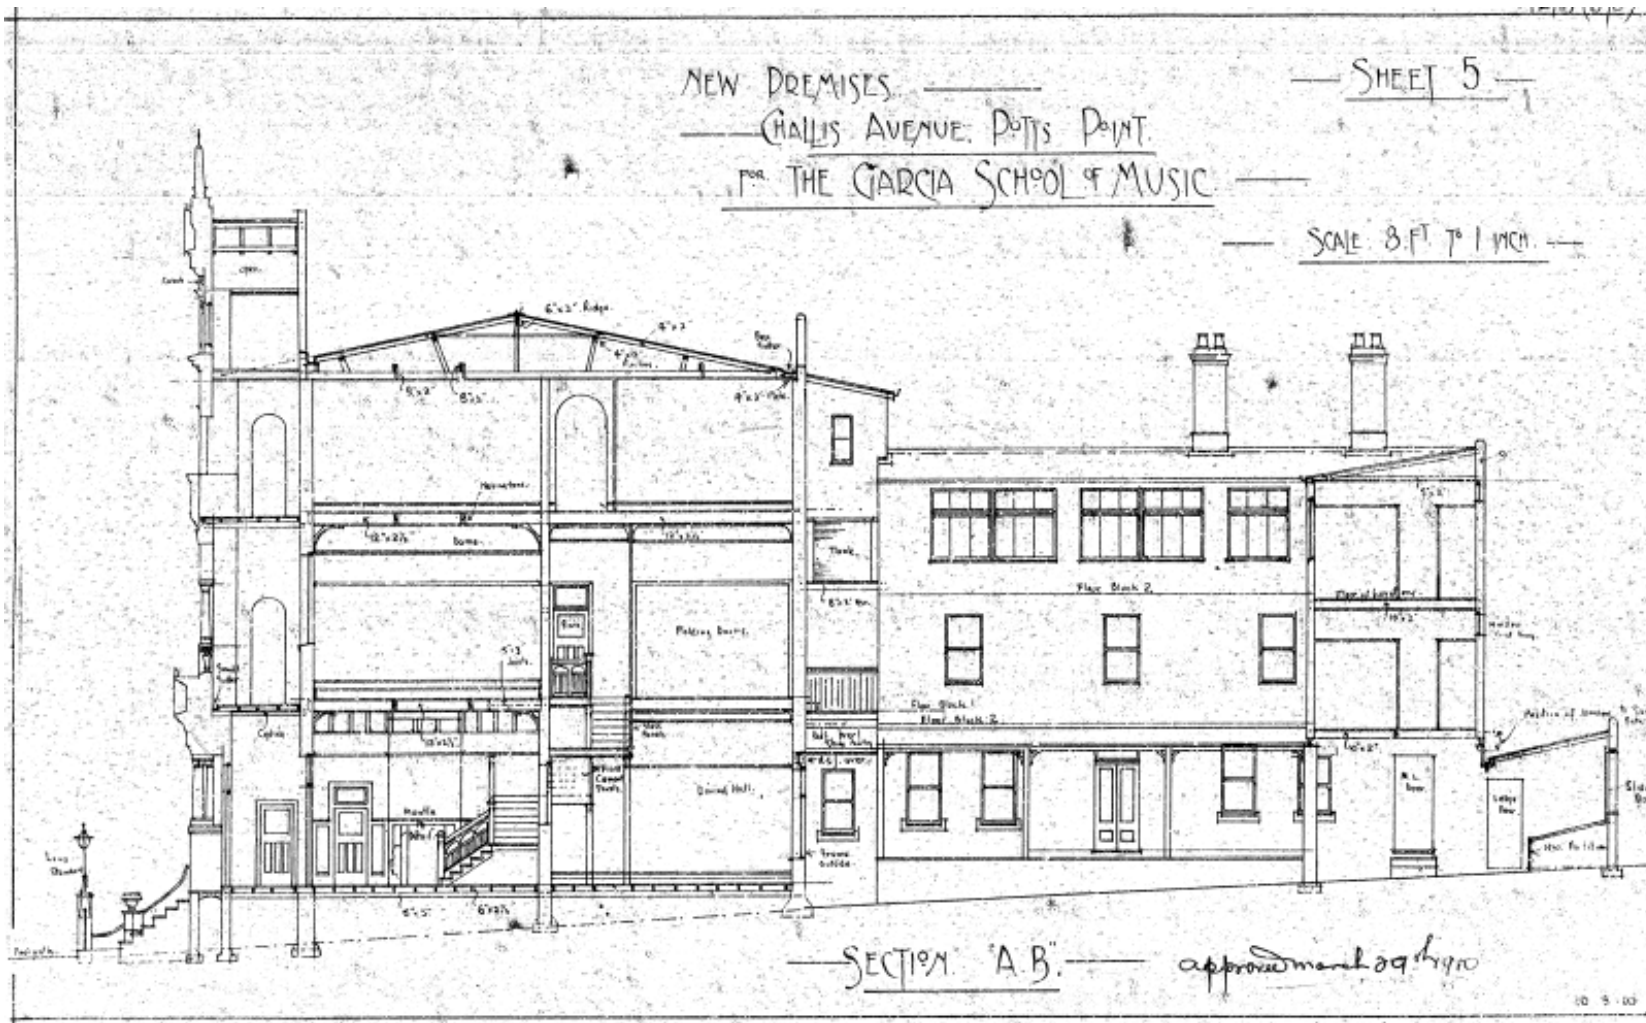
Original Architectural Drawing – Section - Garcia School of Music (Source: City of Sydney Archives)
